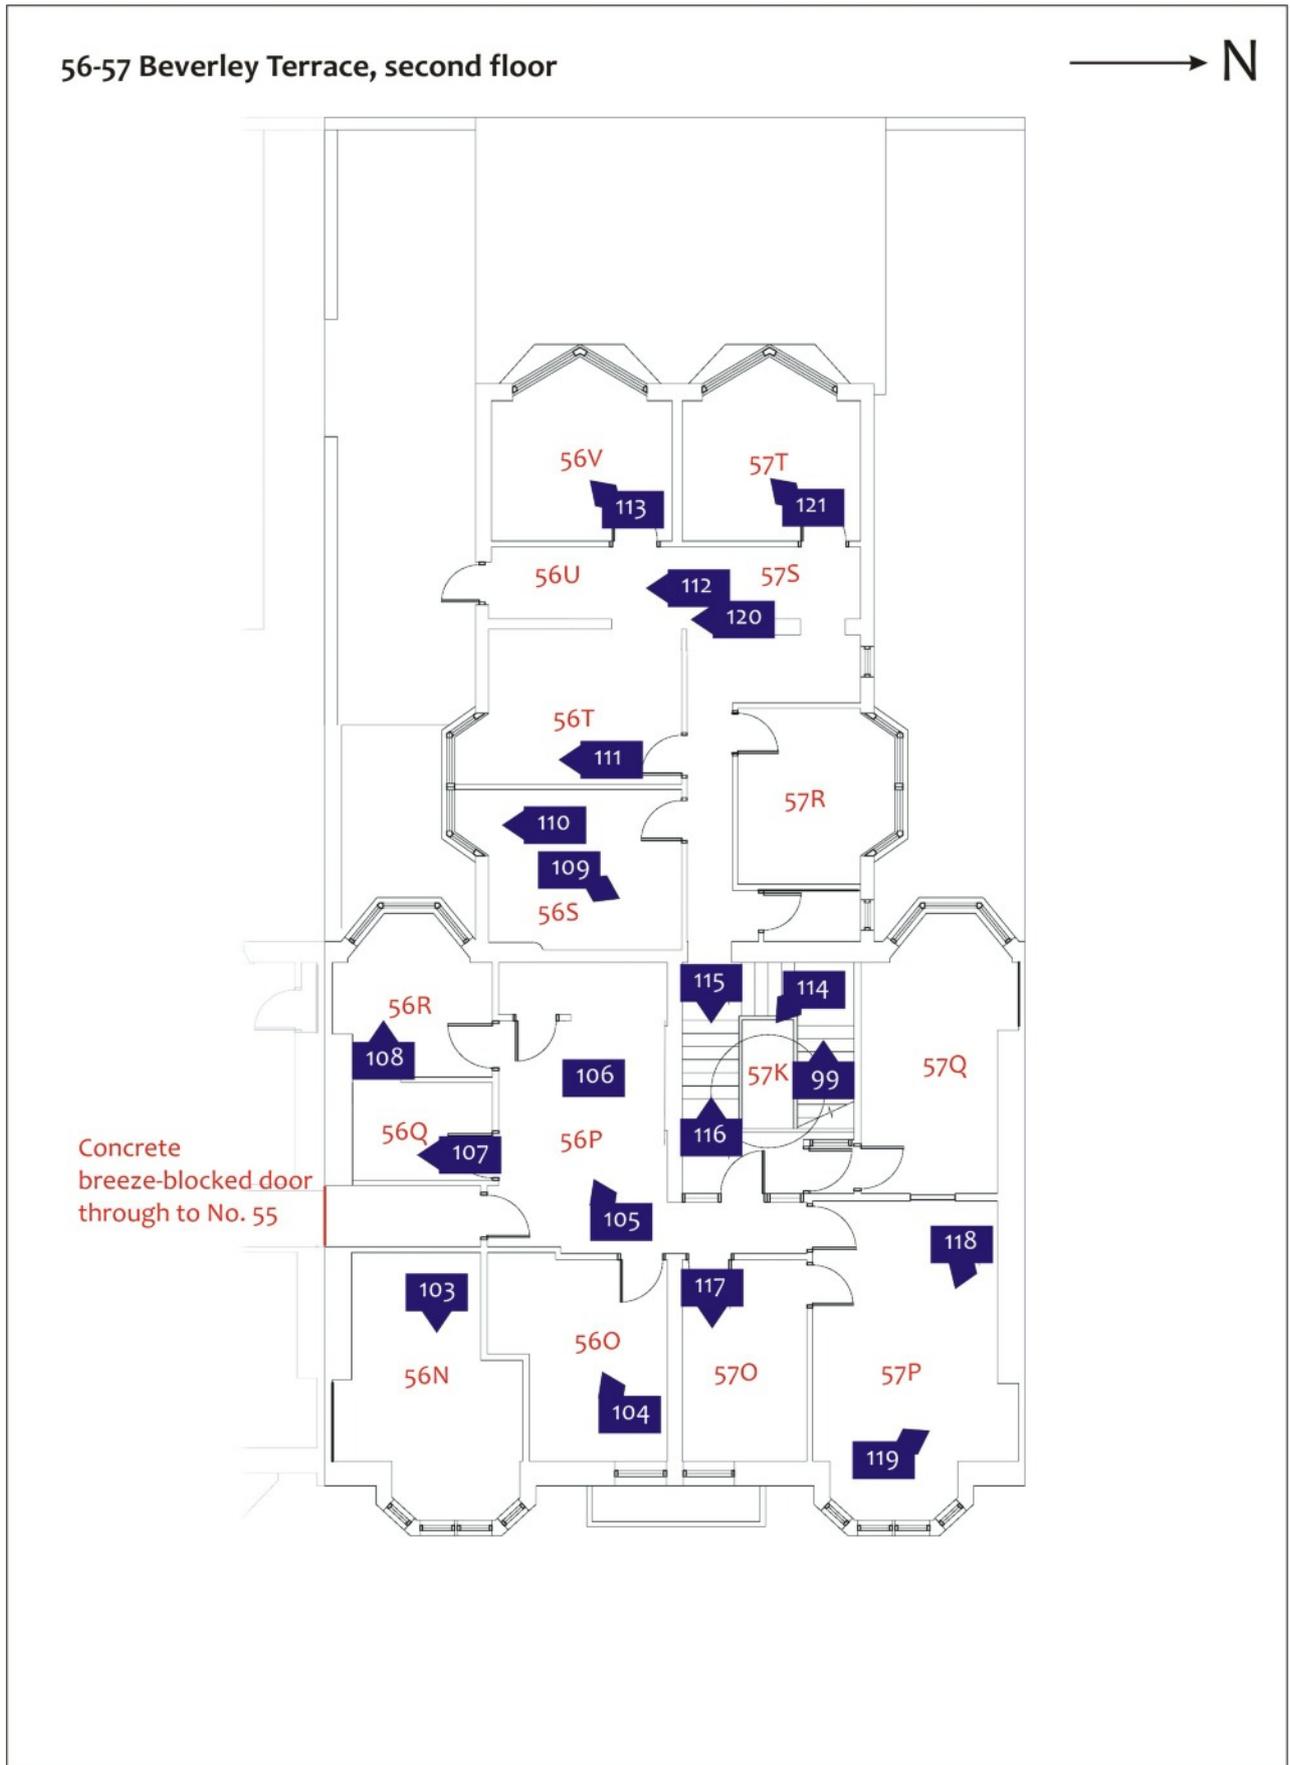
Photograph locations (see Appendix 1) of the second floor of 56-57 Beverley Terrace. Allocated room numbers are in red.
